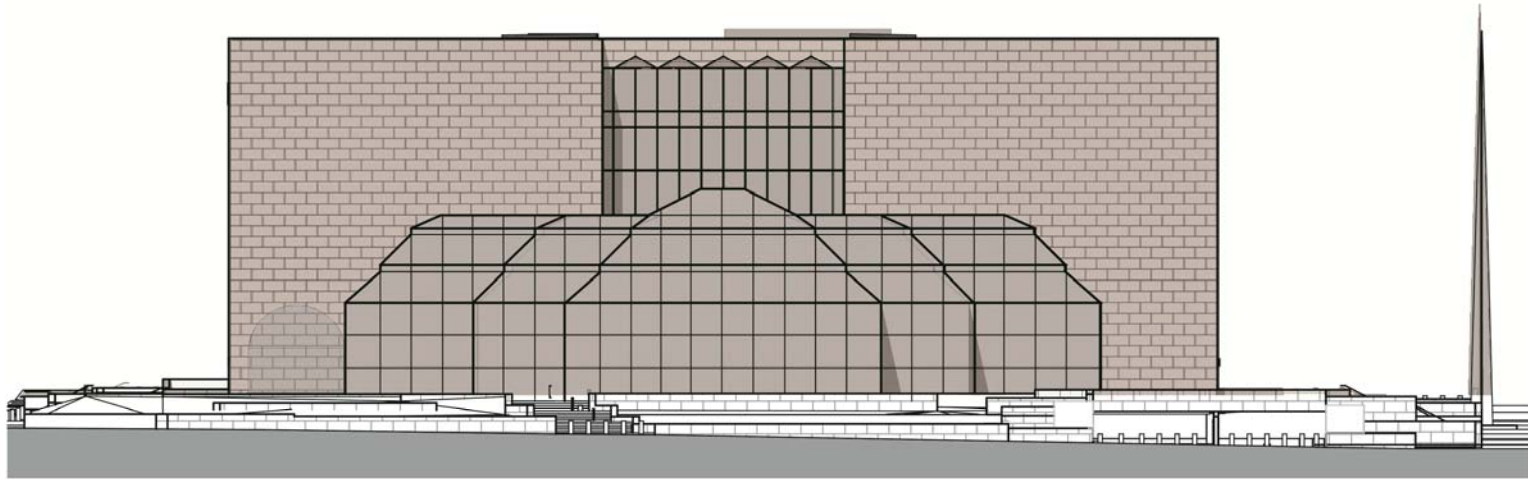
5: Existing east elevation along 4th Street, SW.(Source: QEA.)
